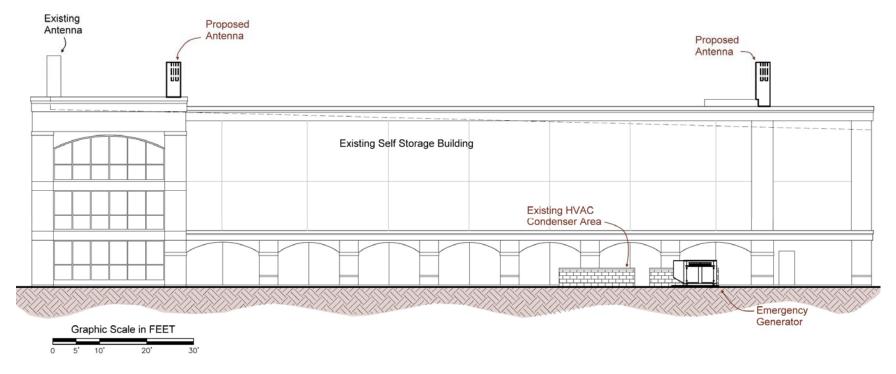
Elevation Plan Showing the Generator and Ground Level on the Southeast Side of the Building
